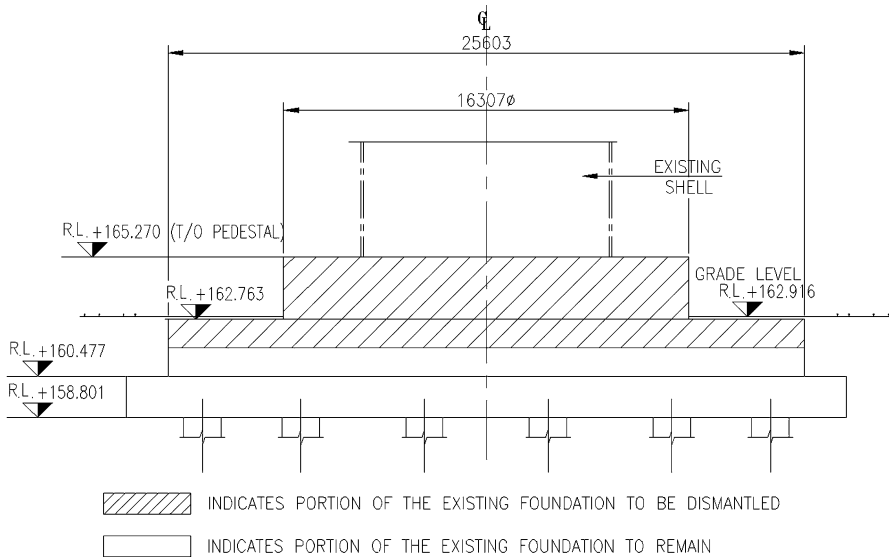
Sectional view of foundation proposed to be partly dismantled and rebuilt
